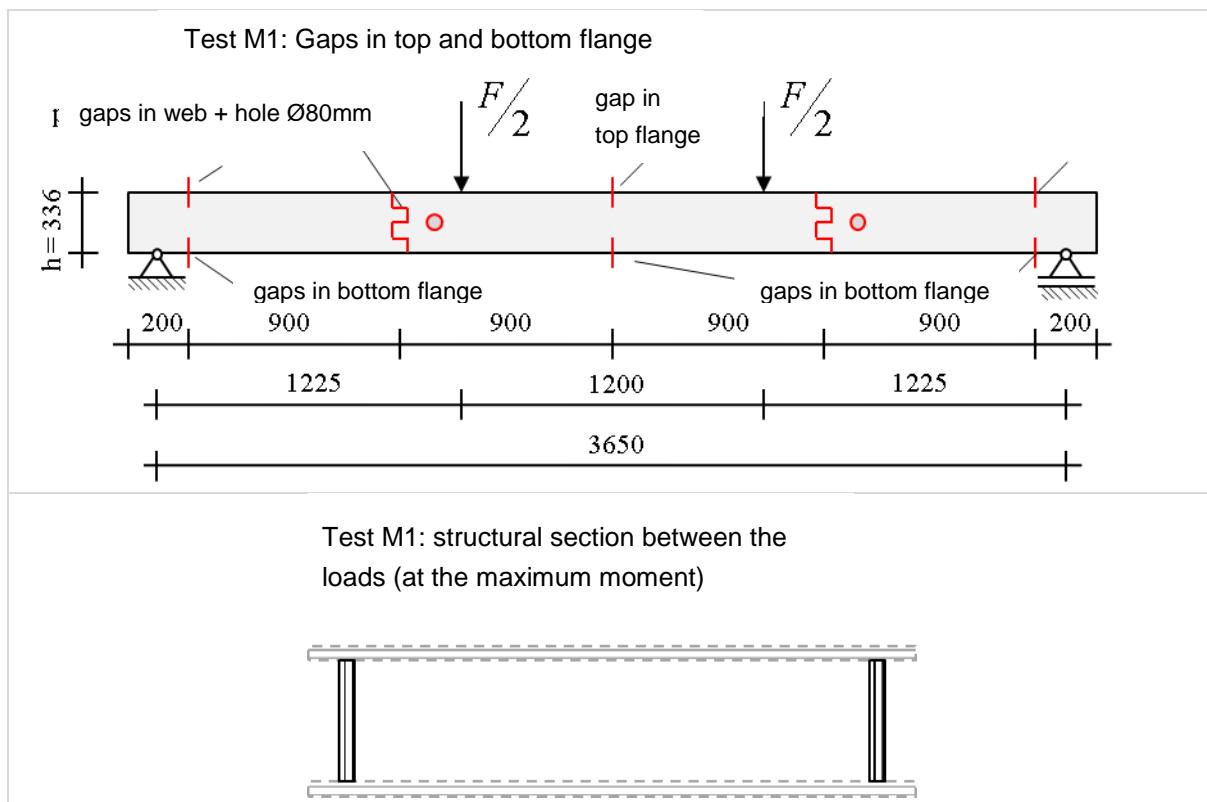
Dimensions of the four-point bending tests on bending, series M1 (top and bottom flange interrupted).
